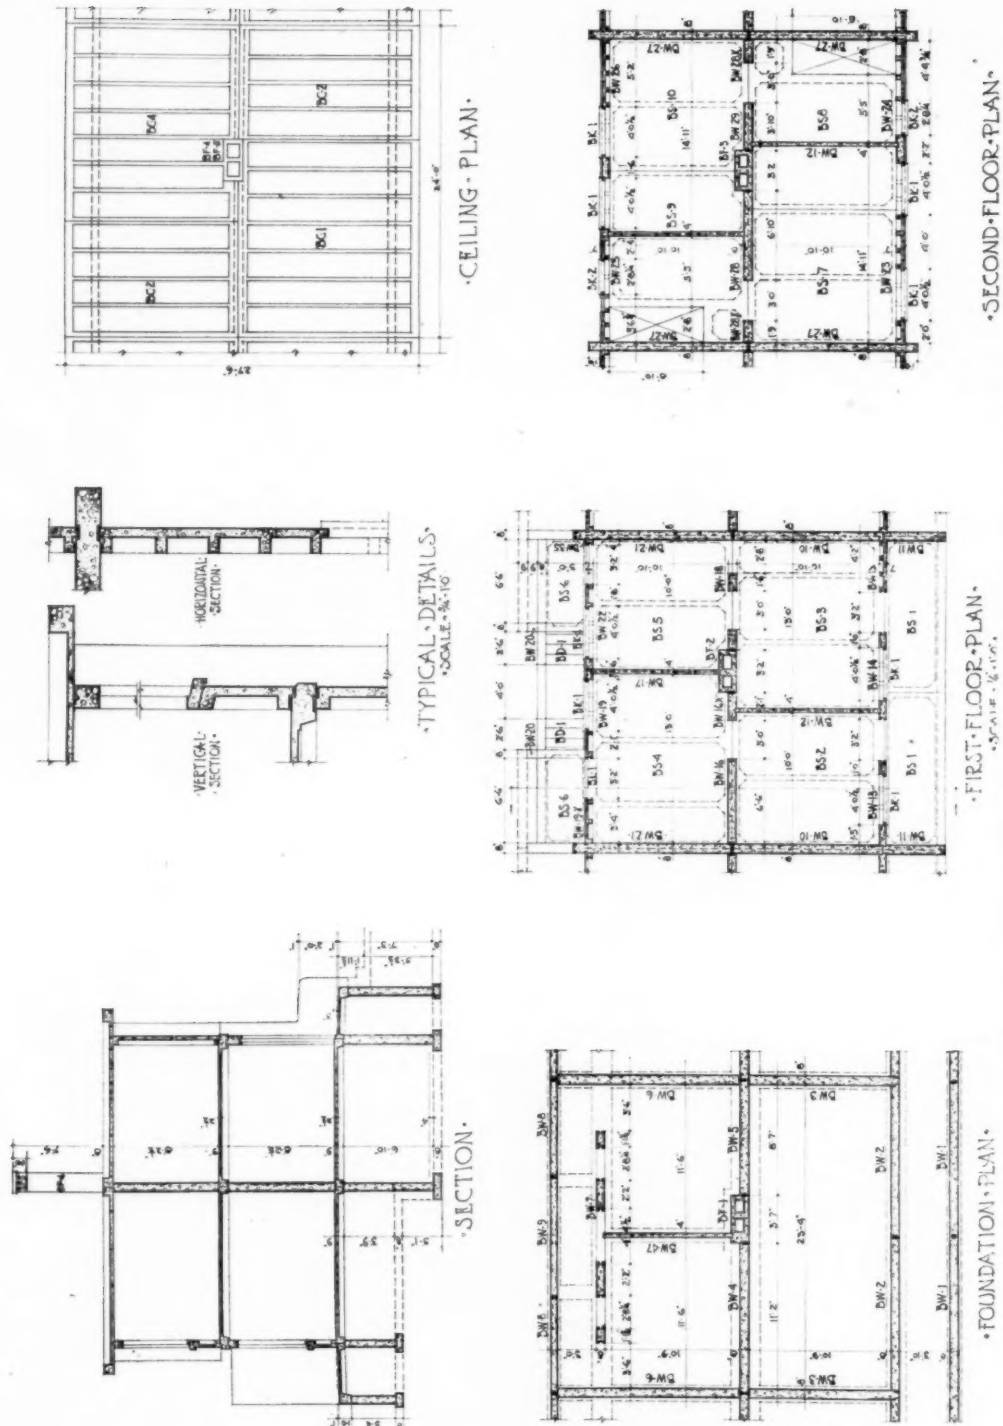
ENGINEERING DRAWING. TWO FAMILY HOUSE, 3 ROOMS AND BATH
